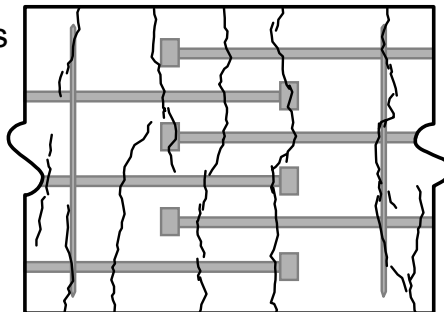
Crack development in a typical unconfined lap splice test (specimen LS-08-04.04-12-10(N)-1)
